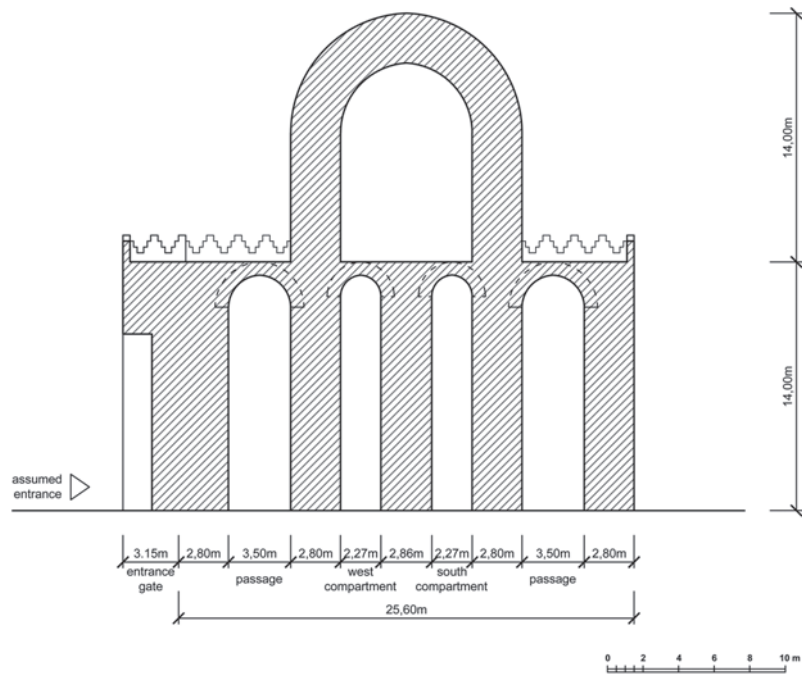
Reconstructed architectural section AA by Ahmet Çinici at a scale of 1:250.
